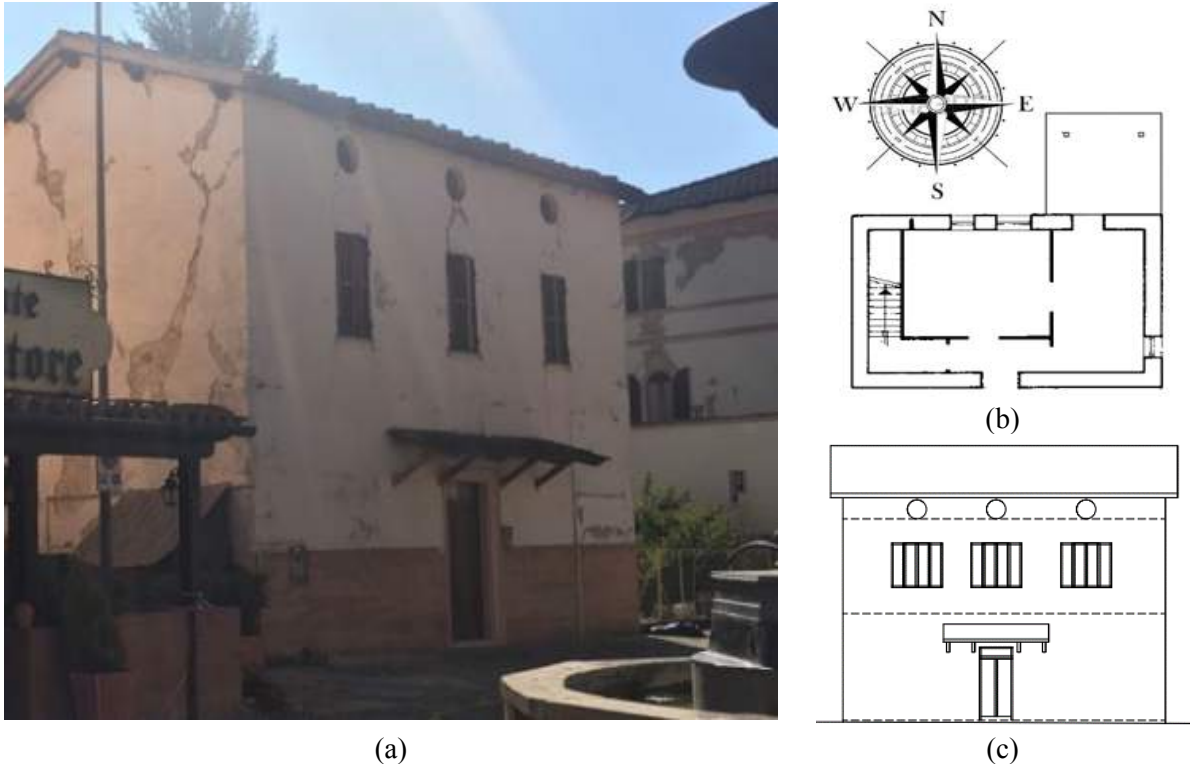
The case study building n.45, (a) street view, intermediate floor (b) and (c) North prospect.
